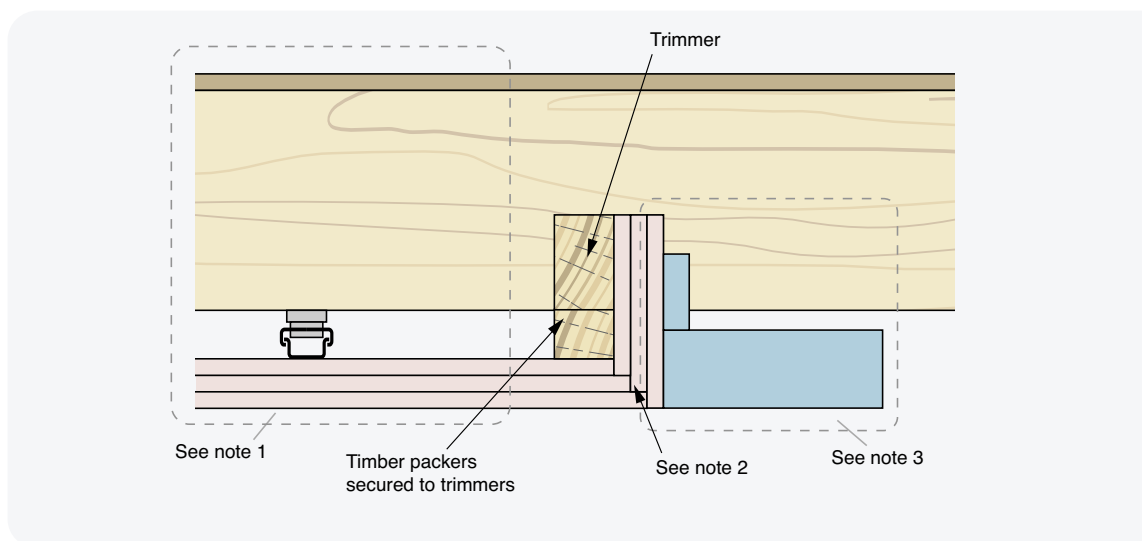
Access panel in a fire-protected floor/ceiling system.
